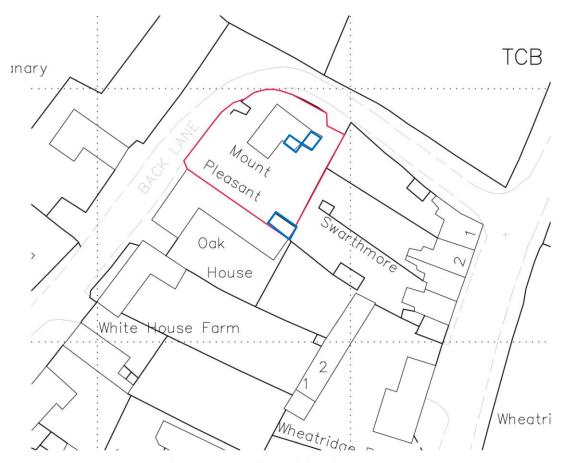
Location of development area Plan provided by developer. Buildings to be demolished highlighted in blue
